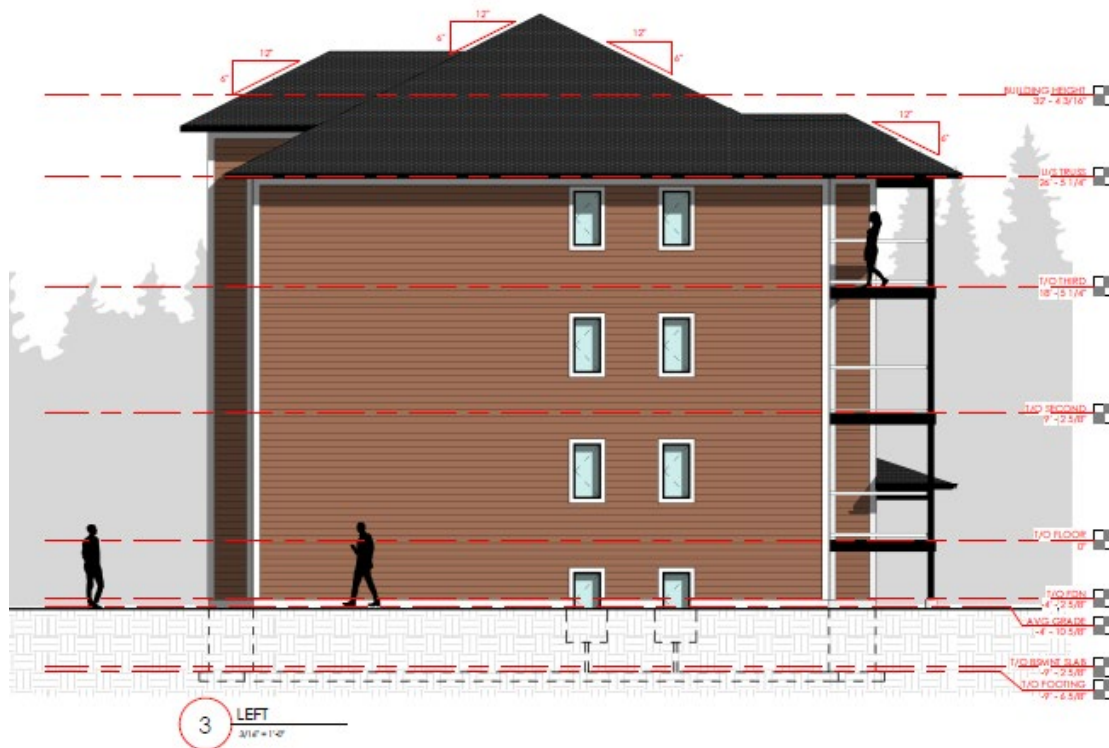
Conceptual Elevations, prepared by Wilson Architectural Design
